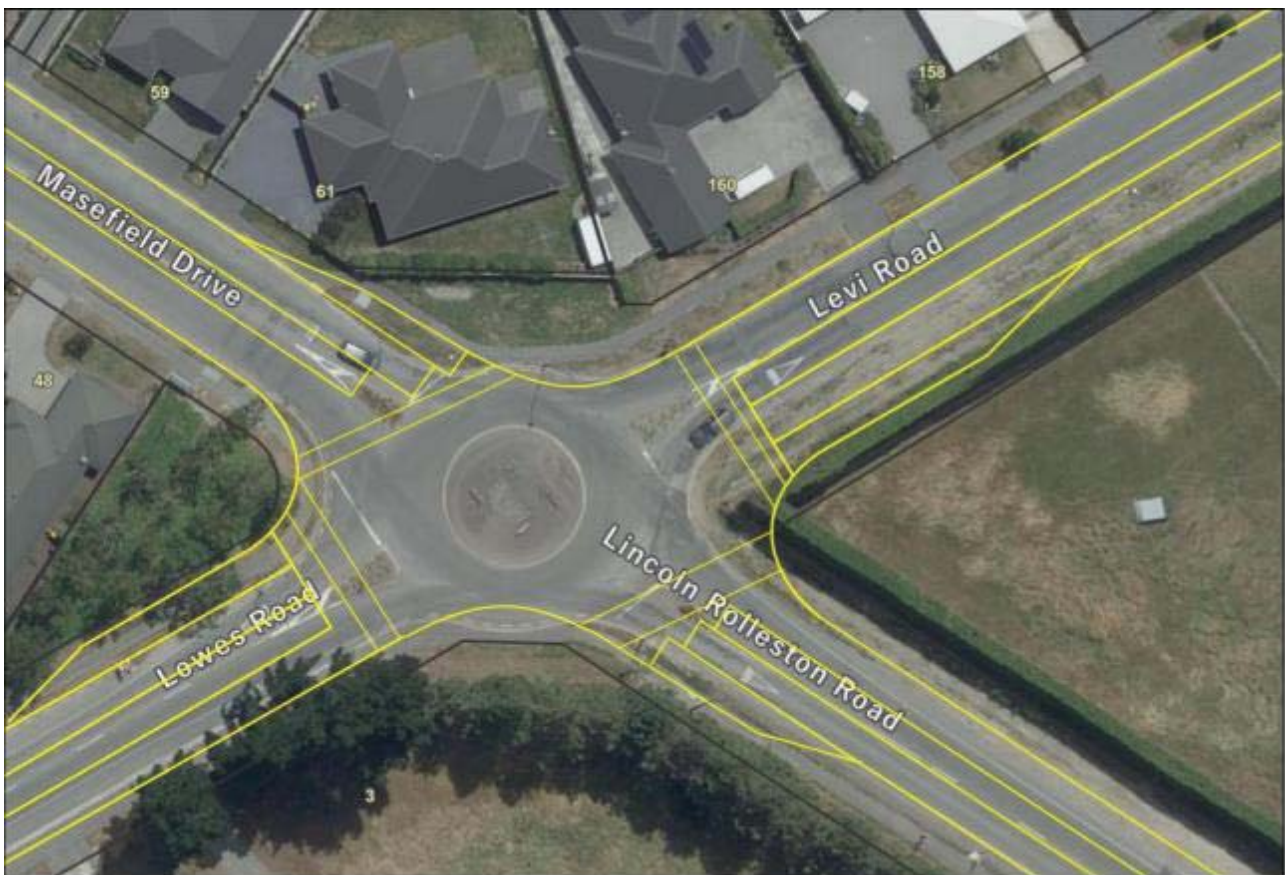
Sketch of Levi Road/ Lincoln Rolleston Road upgrade
